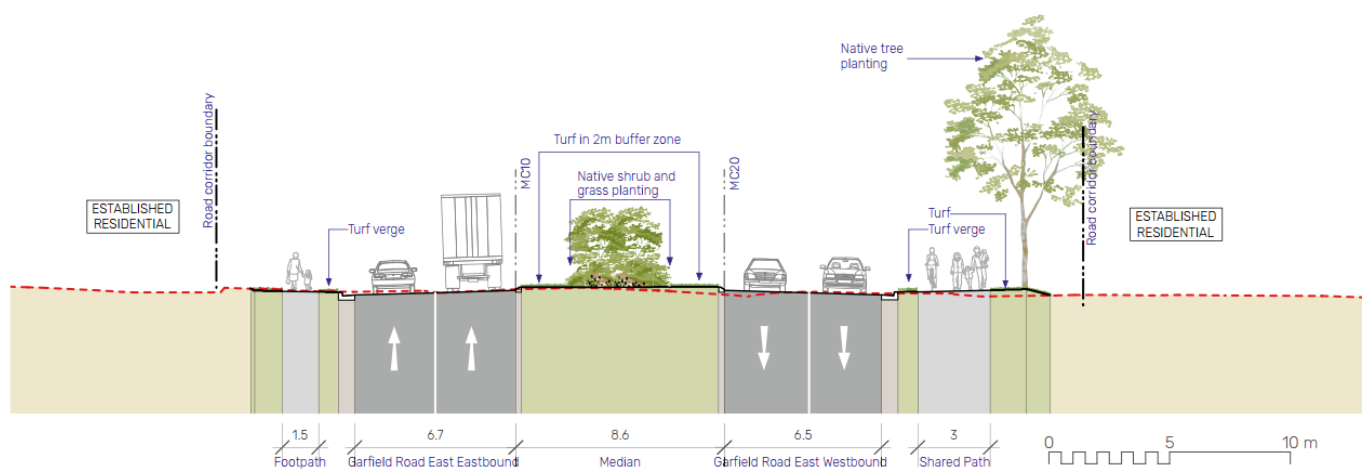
Typical cross-section of the proposed Garfield Road East at chainage 900 (source: SMM, 2020)
